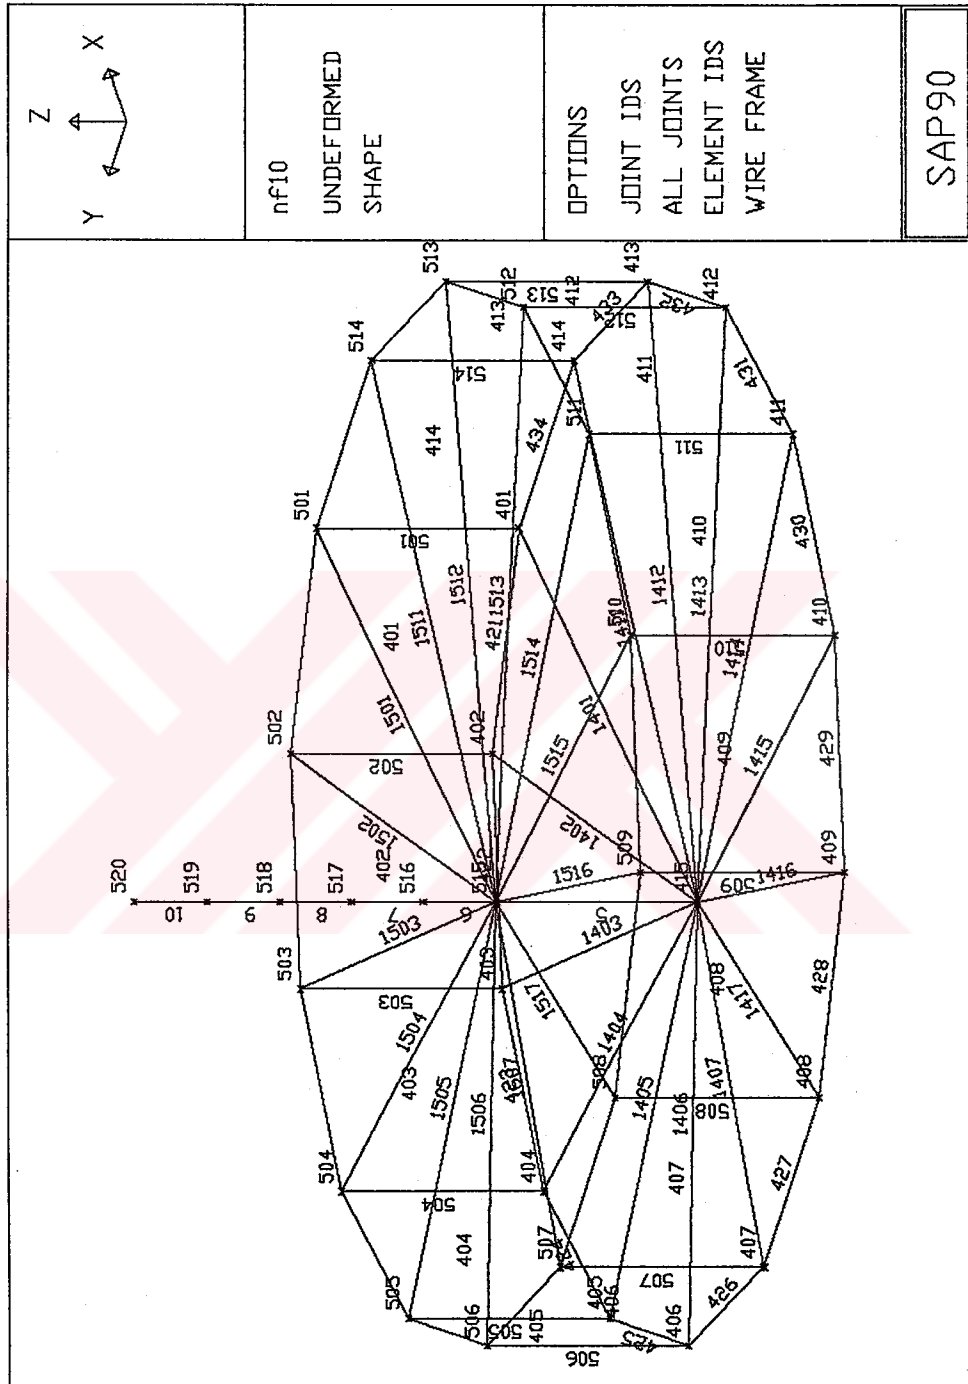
Model of the Structure between +10.00m ~ +20.00m Elevations
